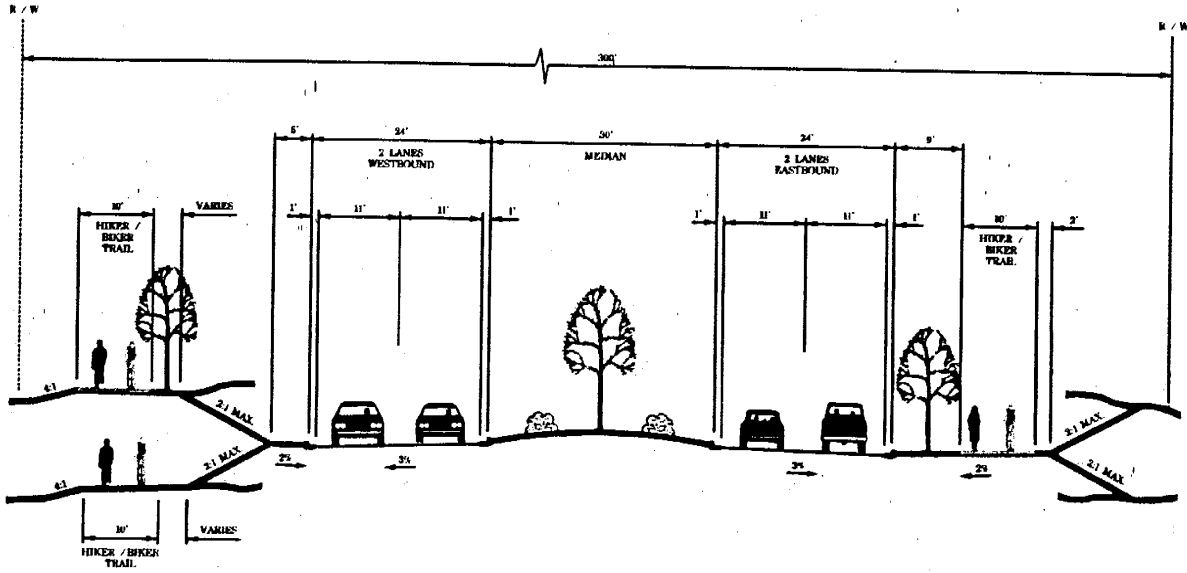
Figure II-F: Typical Section from Parklawn Drive to just West of Rock Creek Park
